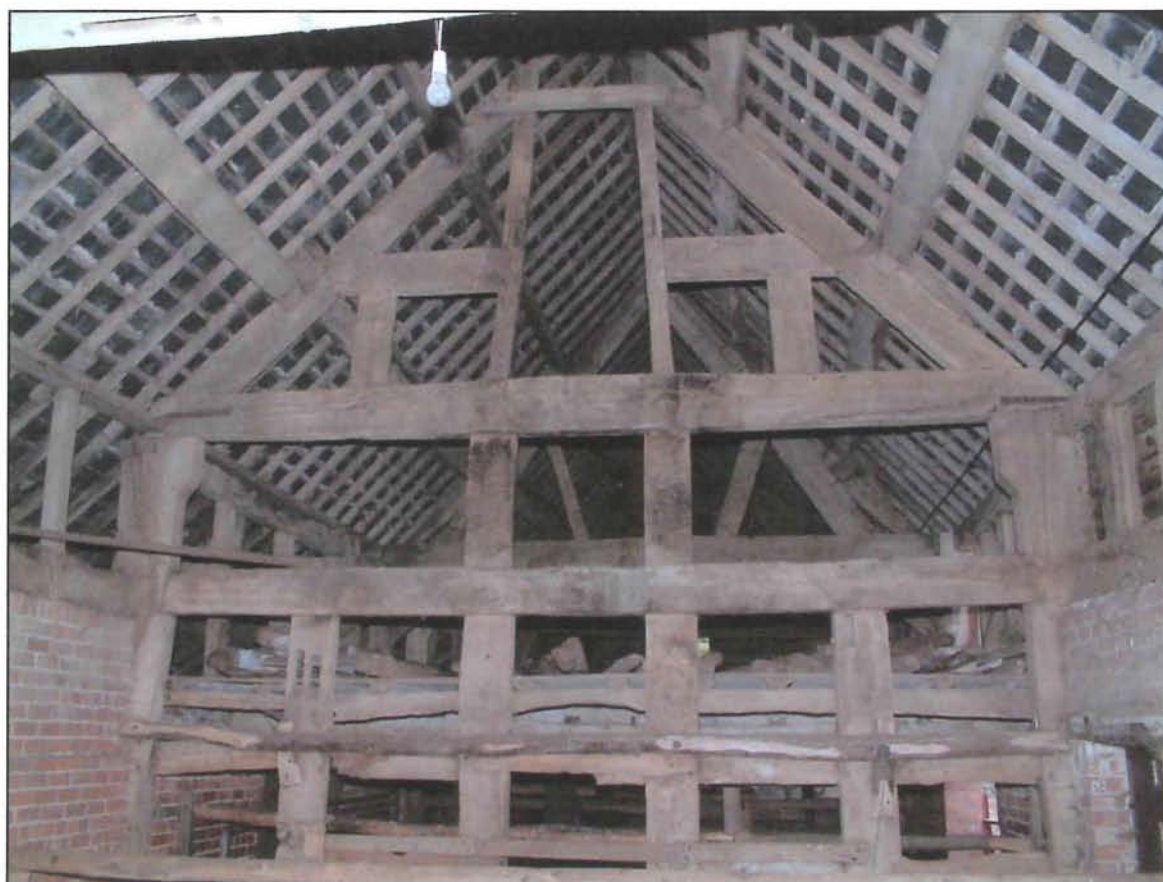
Barn 3 Truss 5. Photo CPAT 1682.103
